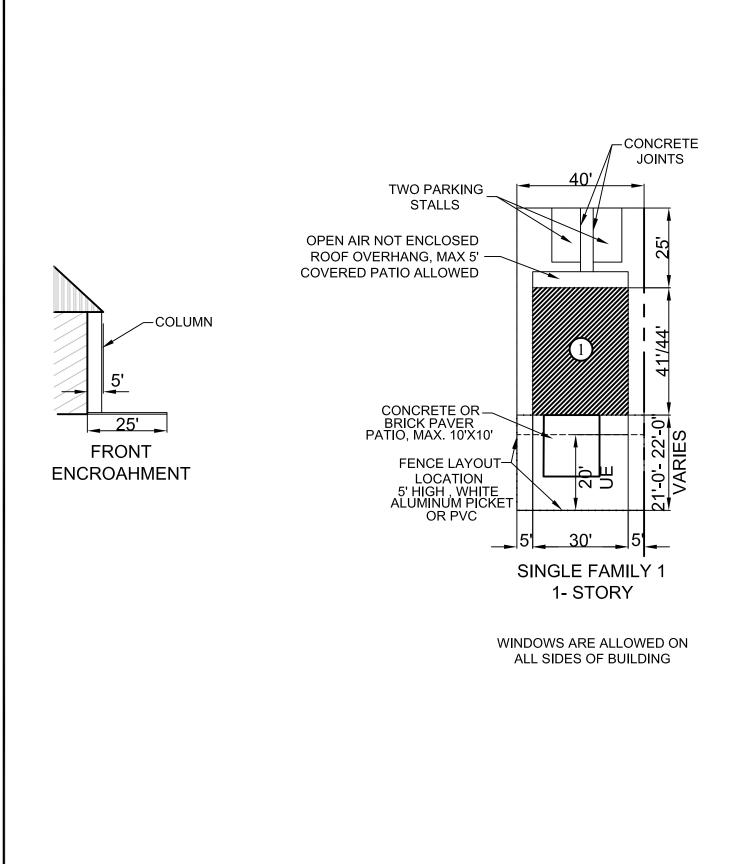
TYPICAL RESIDENTIAL PLAN TYPE B (LOTS 19 - 27)
